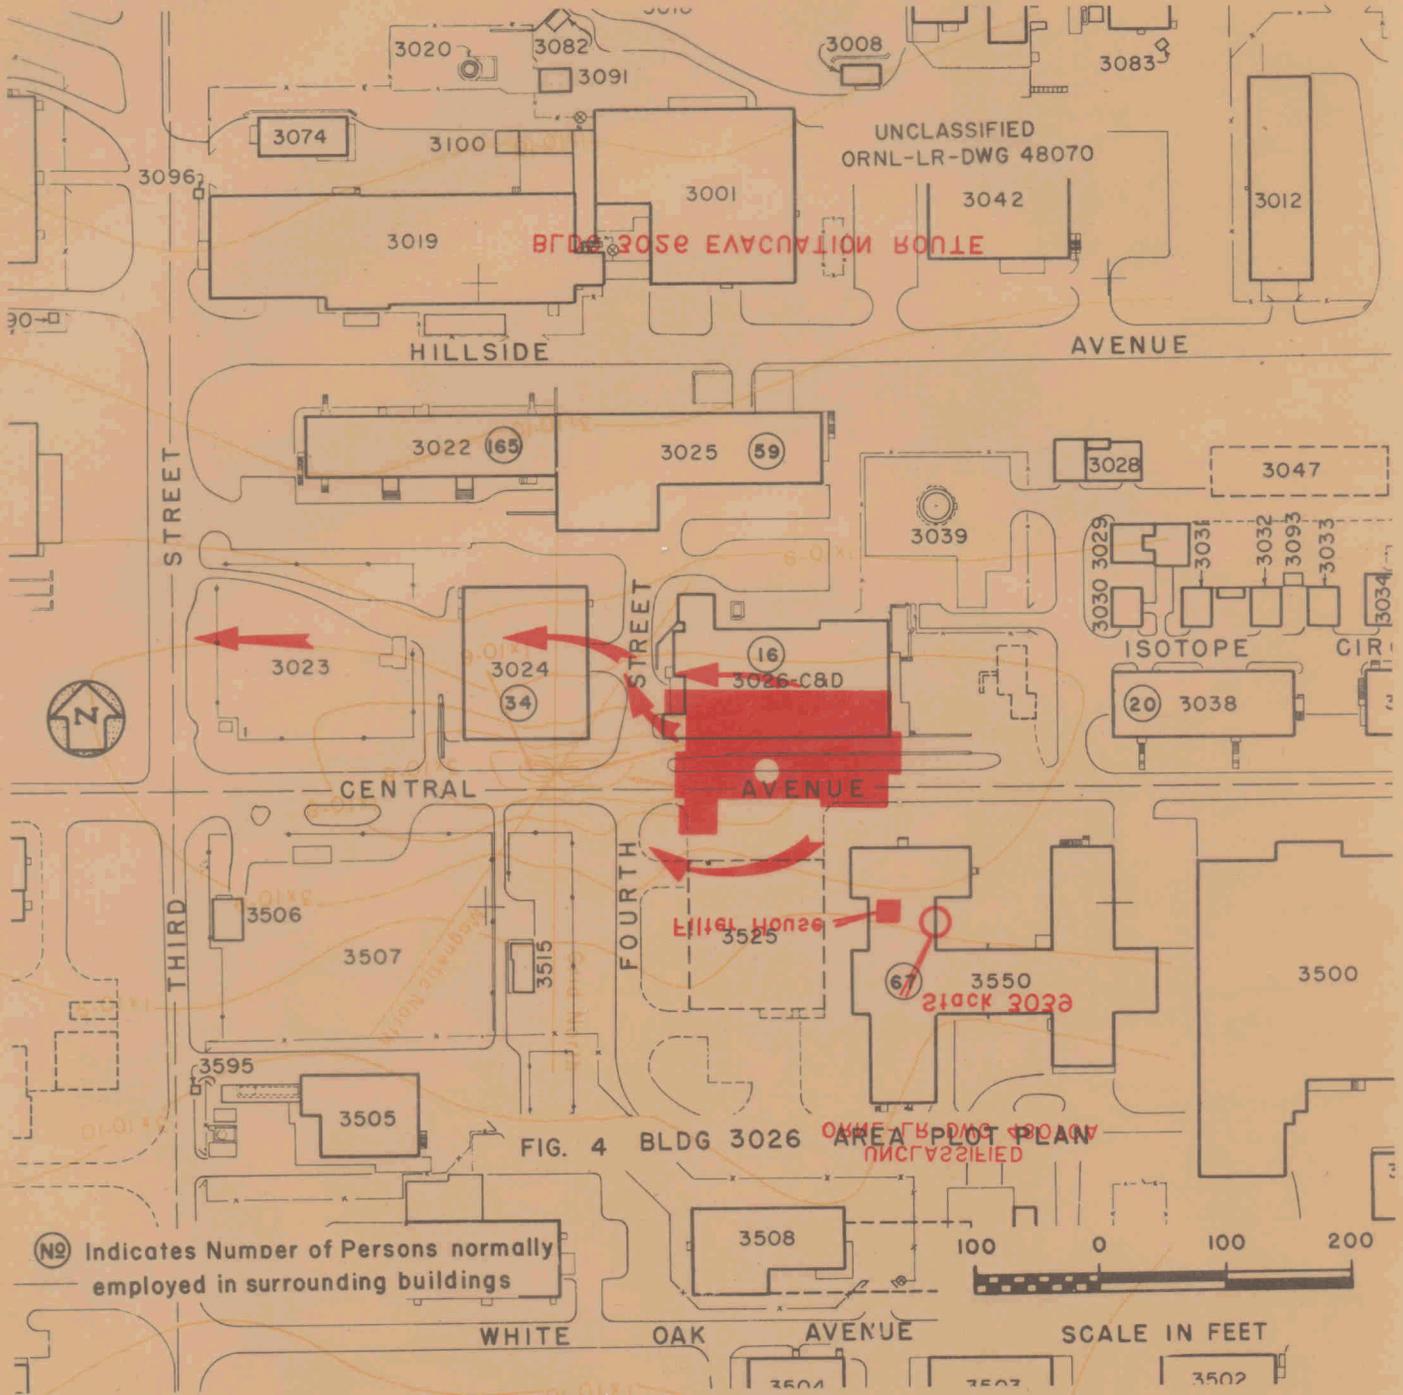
BLDG 3026 AREA FLOOR PLAN UNCLASSIFIED
